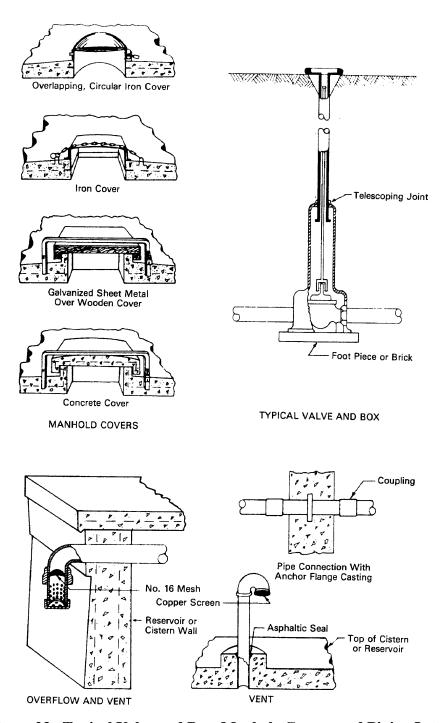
Typical Valve and Box, Manhole Covers, and Piping Installation
